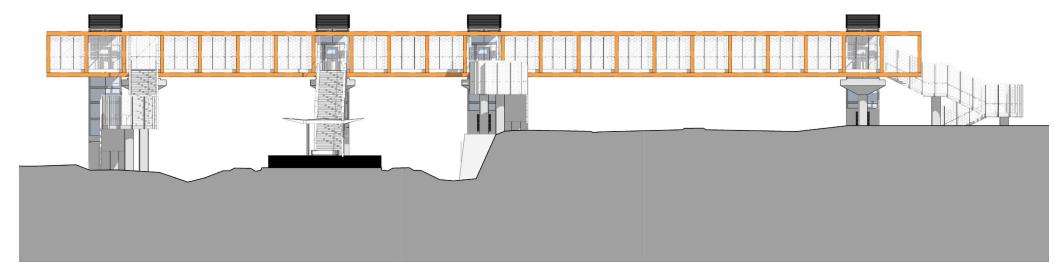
Indicative view of the new pedestrian bridge looking south (subject to detailed design) (MRB, 2021)
